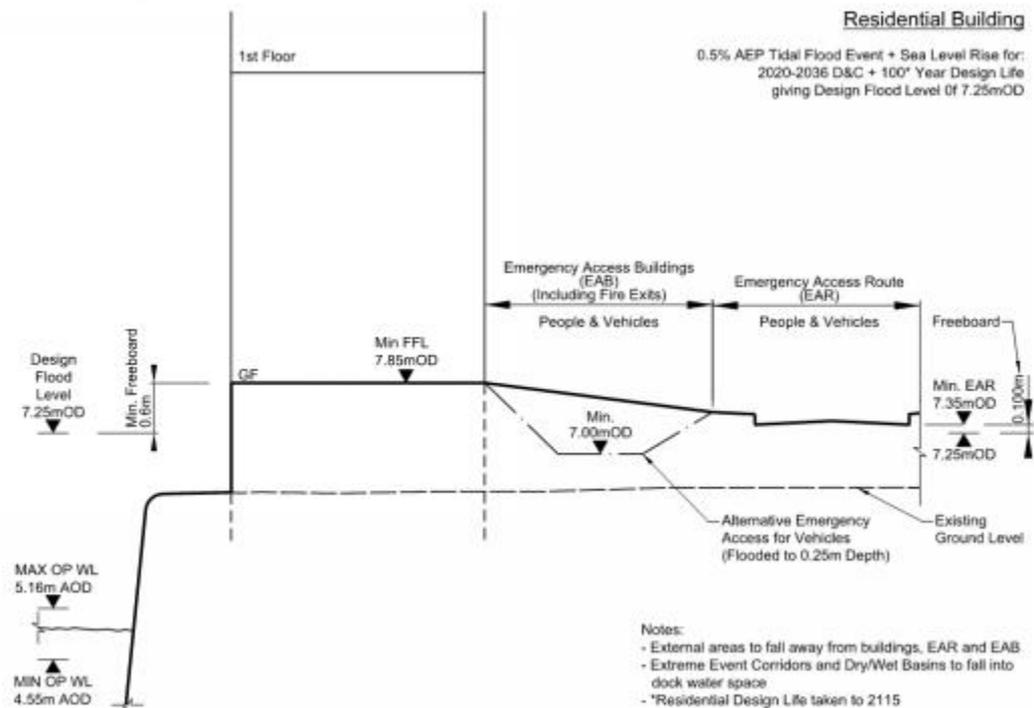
Curtins Condition 21 Report Residential Building Floor Levels
